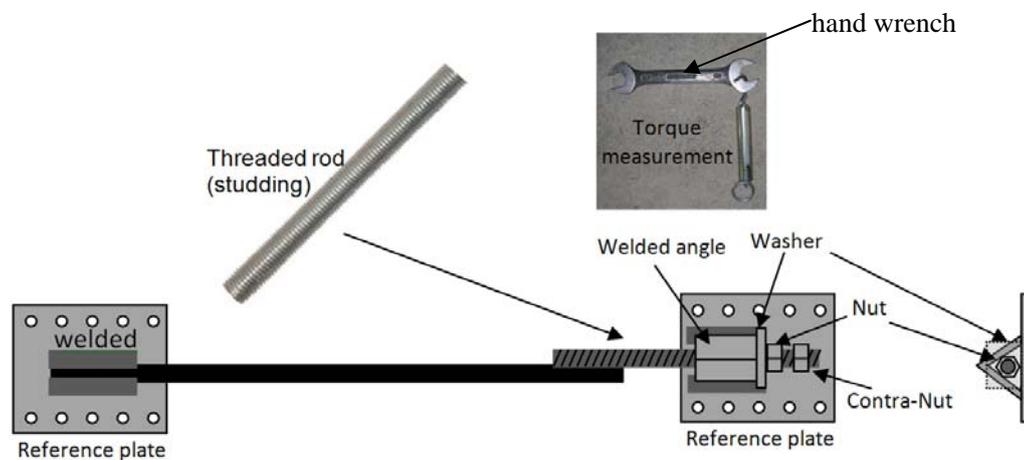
Schematic representation of post tensioning mechanism using bolts.
